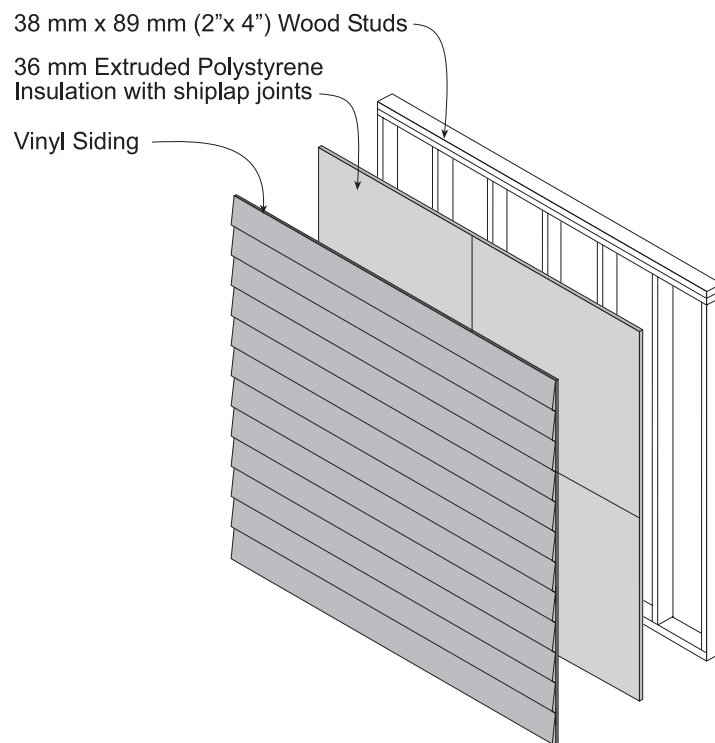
Vinyl siding-clad wall (specimen No. 17) with compartmentalized horizontal cavities behind the siding
